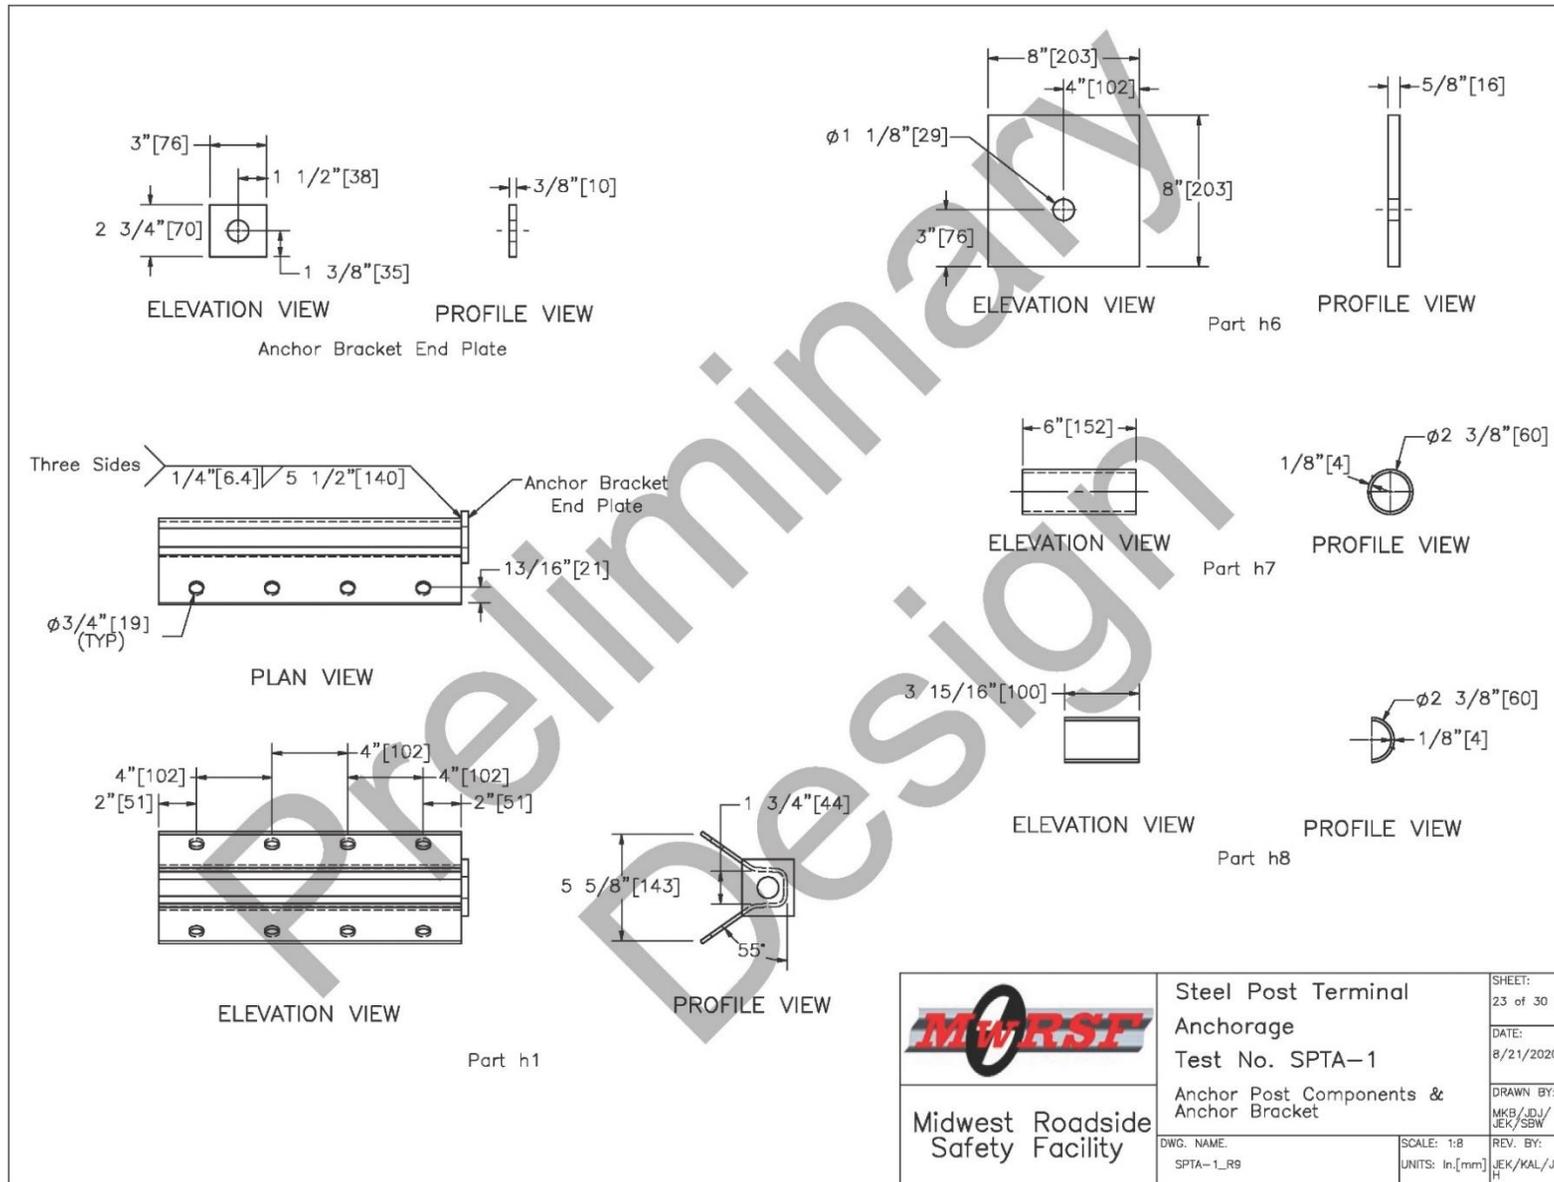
Anchor Post Components and Anchor Bracket, Test No. SPTA-1
